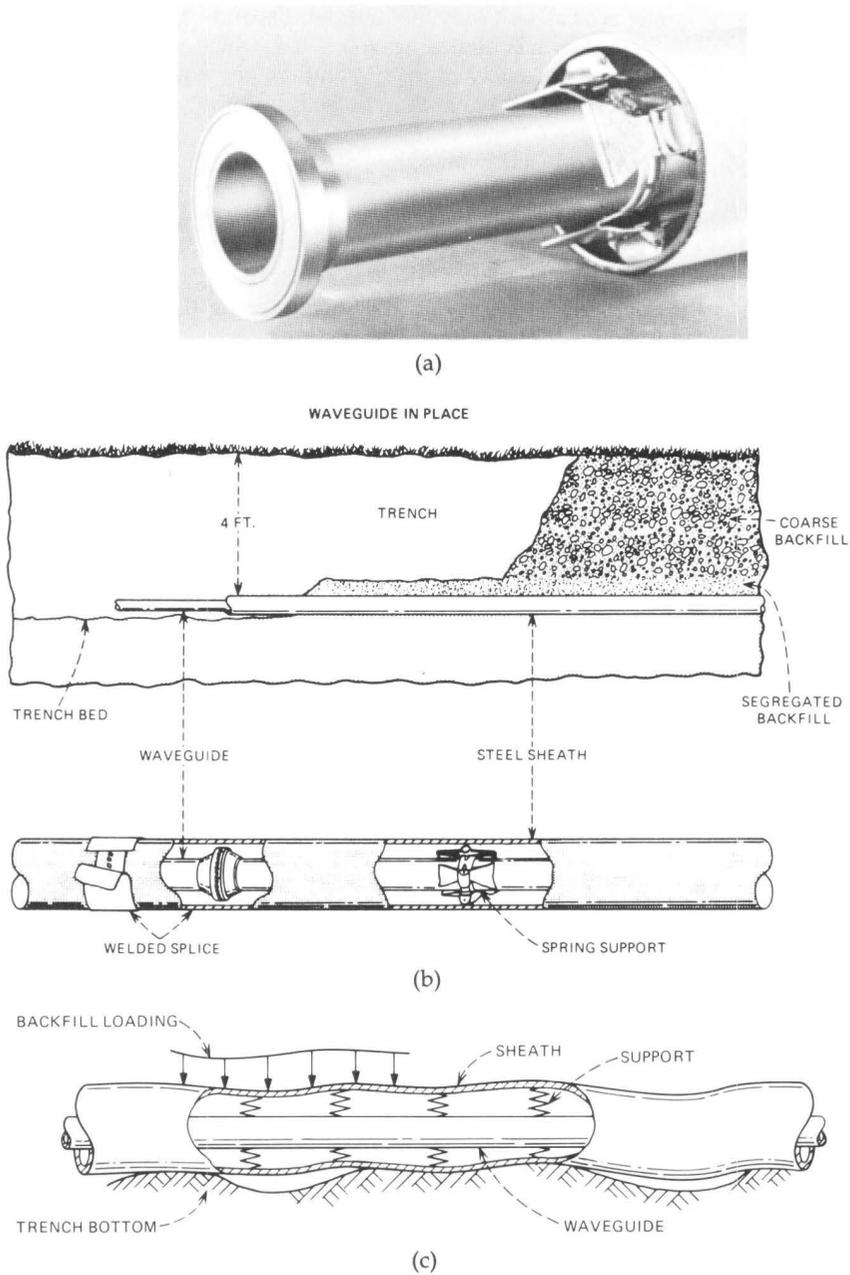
The millimeter waveguide support and sheath design. (a) Butterfly spring-roller supported waveguide in 5-1/2-inch inside-diameter steel sheath. (b) Buried sheath and waveguide. (c) The sheath and spring support formed a two-stage mechanical filter.
